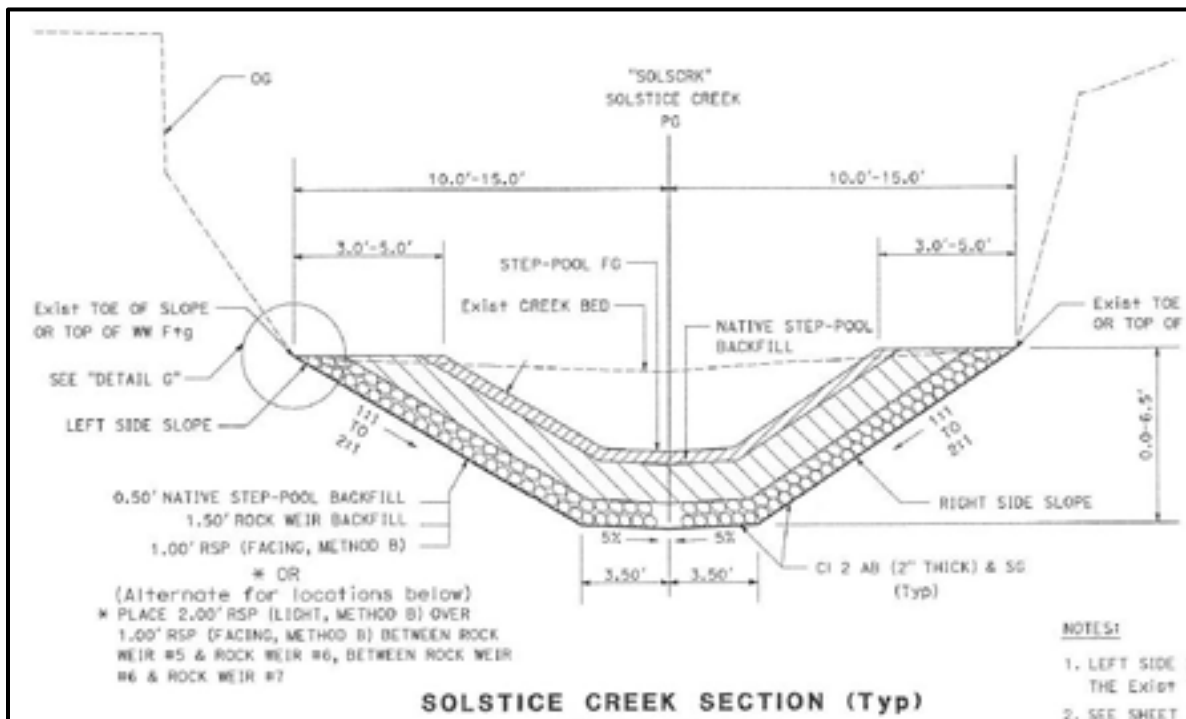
Typical cross-section in a pool between upstream end of culvert and upstream end of proposed rock-lined channel. The rock weir is not shown in this cross-section.
